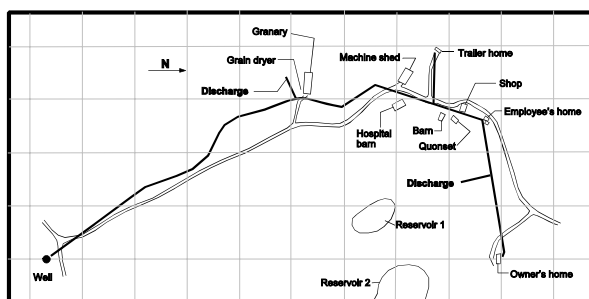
Layout of piping system for the Diamond Ring Ranch.
